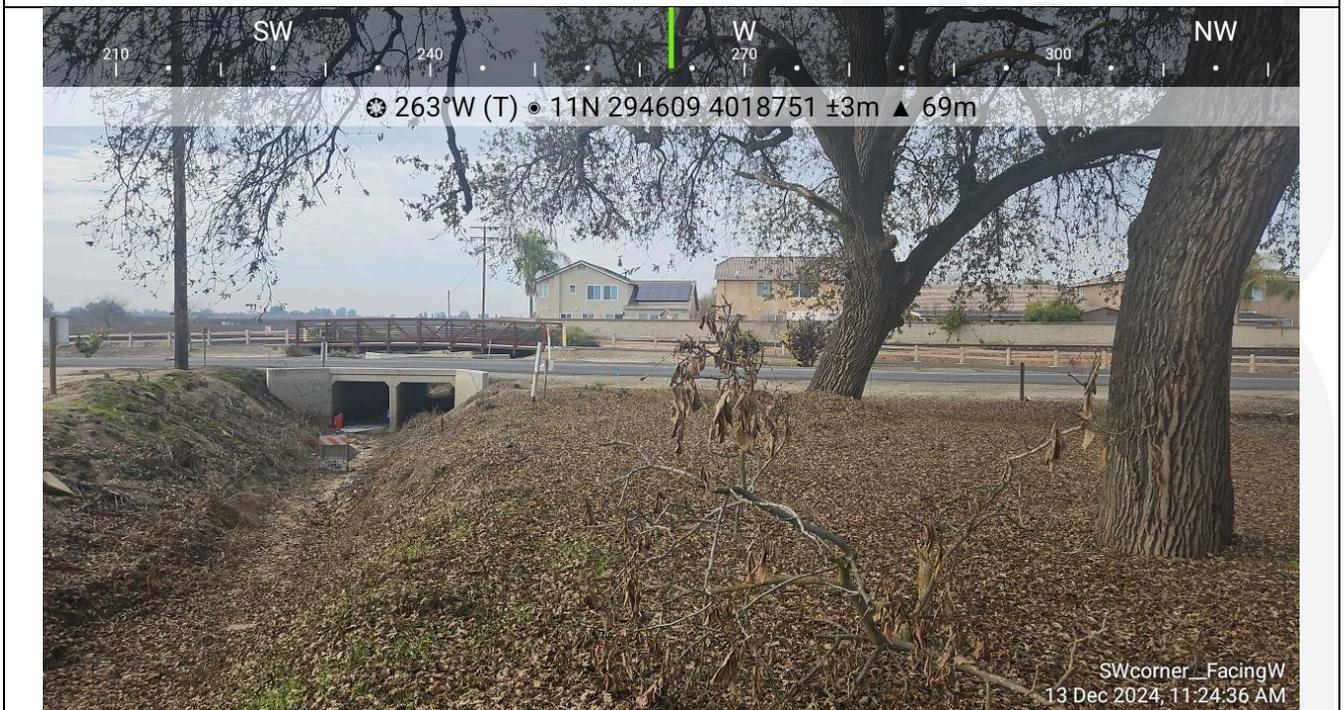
View of site conditions on the southwest corner of the project area facing west.
